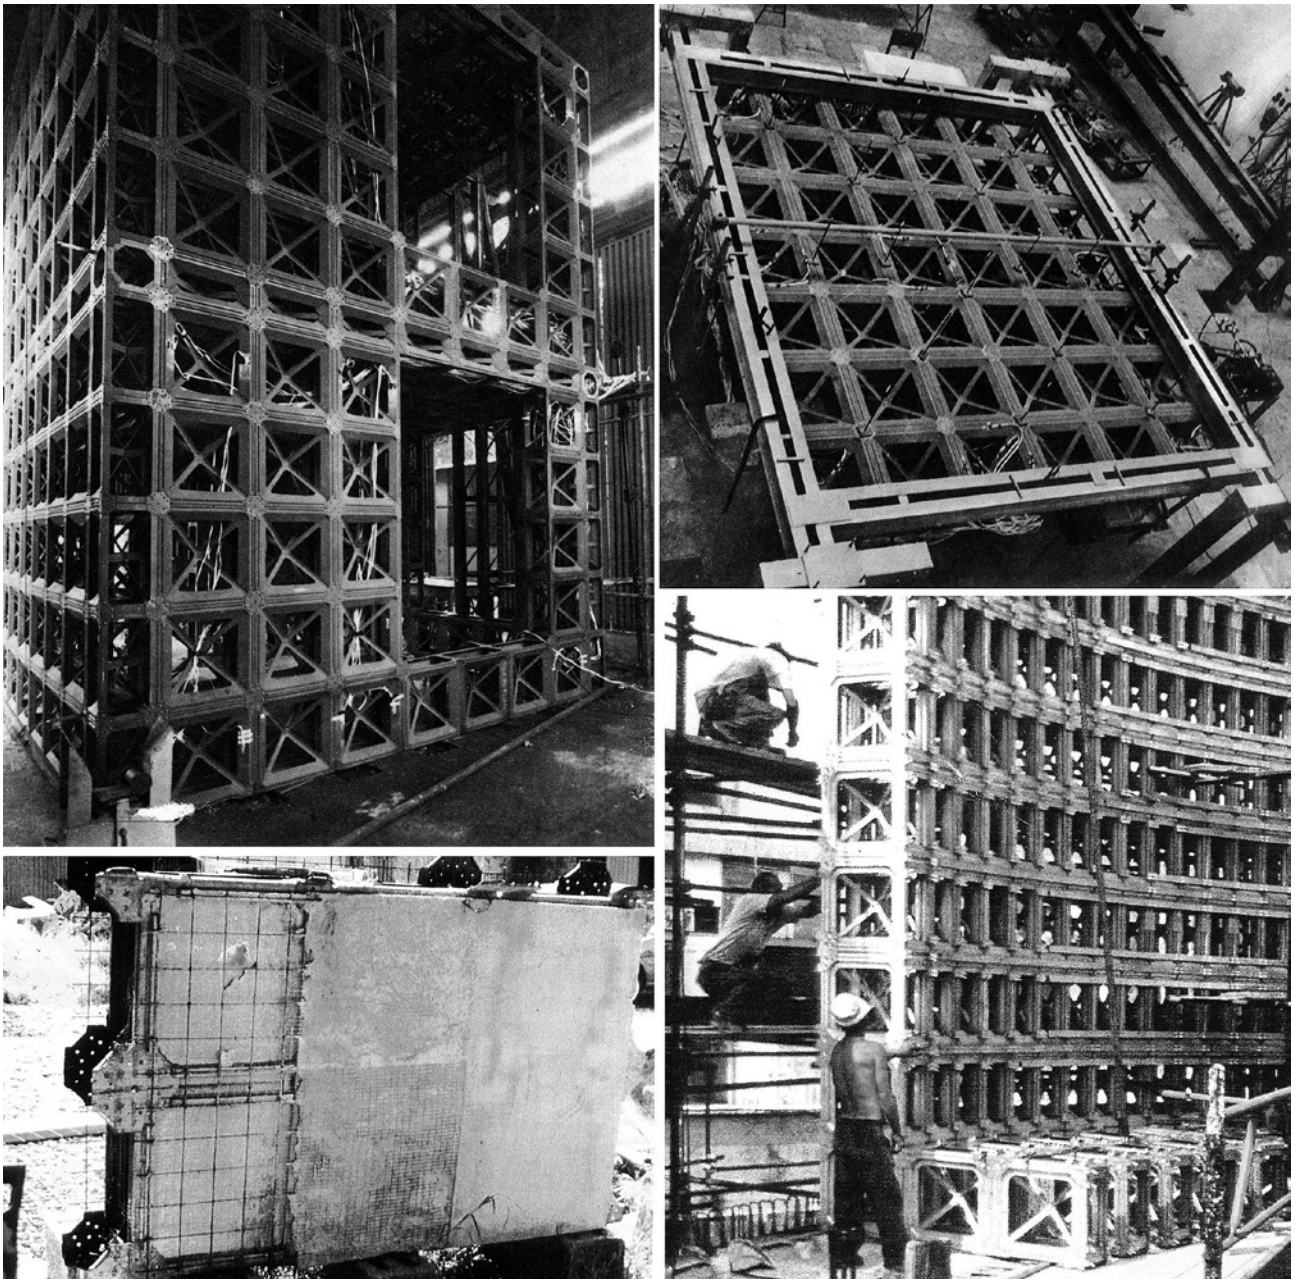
The steel brick developed by Pagano. Top left and right: the walls and slabs composed of steel bricks and tested in the laboratory of CESUN center. Bottom: a curved wall made of steel bricks and the mock-up of the wall. Source: Archivio Michele Pagano.
